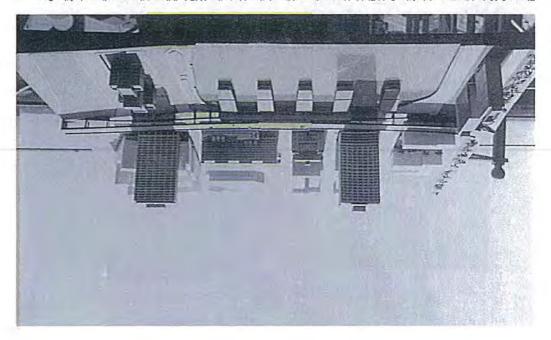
Architects model of the Gold Fields House site and its relationship to the AMP building at the eMP building. Gold Fields House was designed by Peddle Thorp Walker, the same architects who had previously designed the AMP building. (Source: City of Sydney Council Archive)
